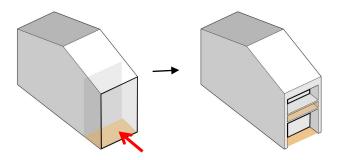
Schematic diagram of building ground floor setback Source: Author's own drawing
